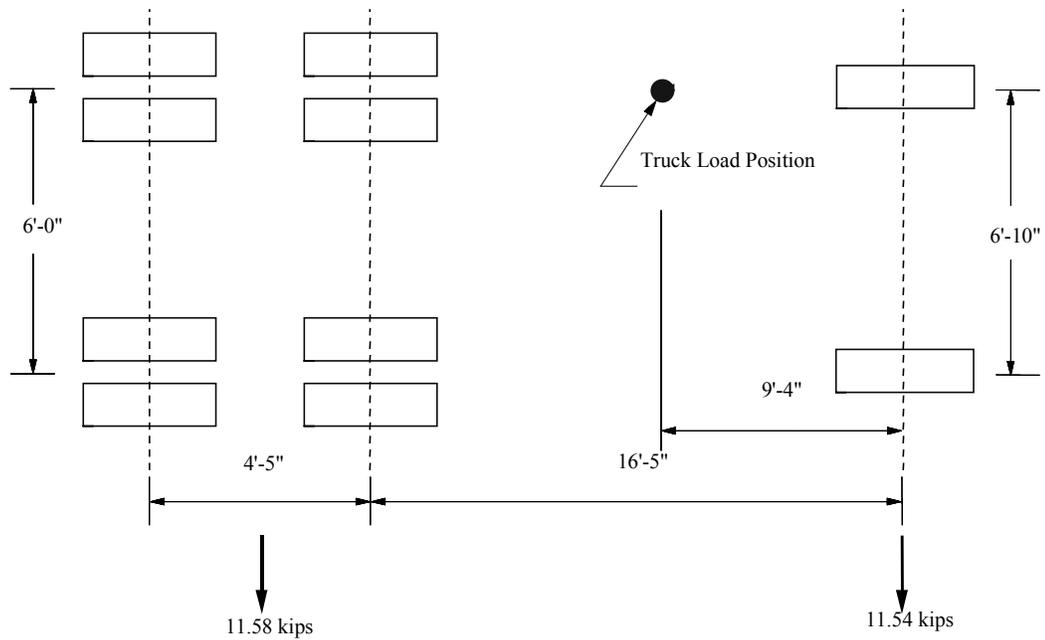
Plan view of live load used for first service load test: Truck No. 23.
